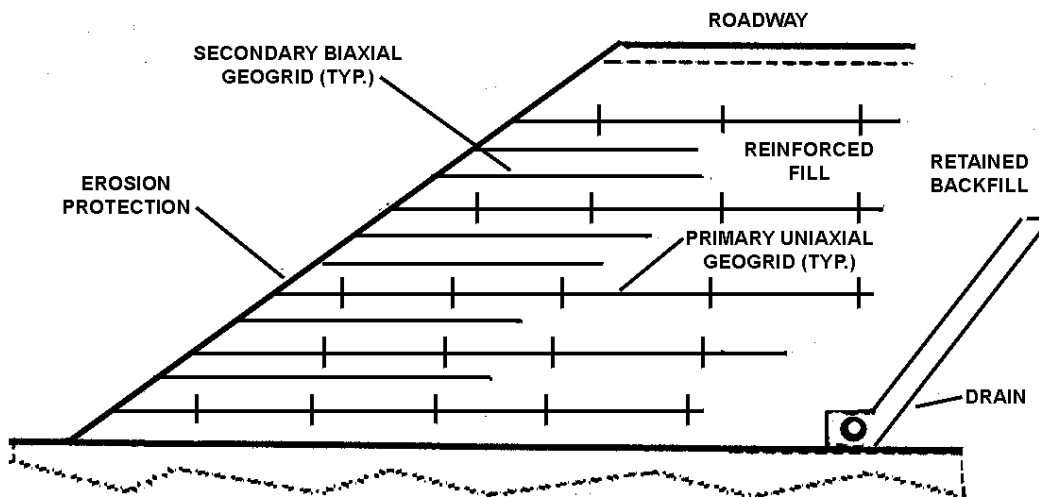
Material and structural components of a typical, reinforced steepened slope (adapted from Berg et. al., 1990)
